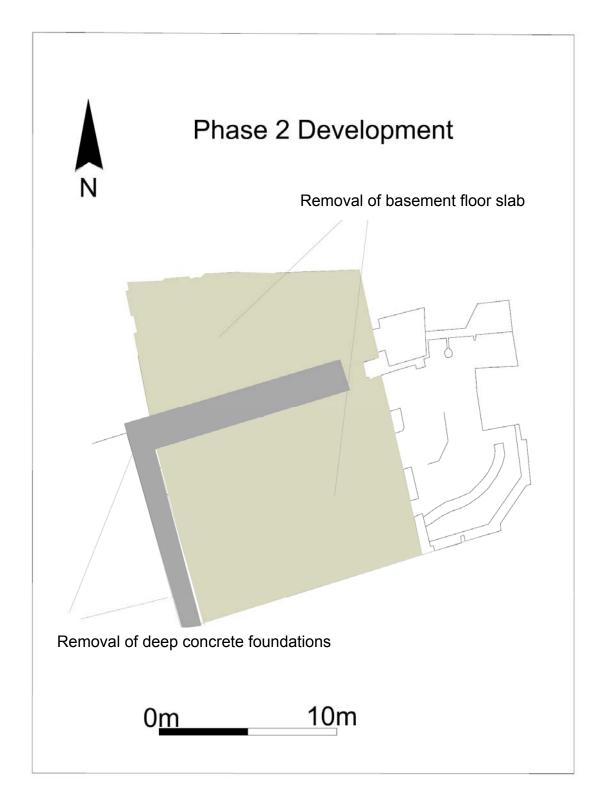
Location plan of the removed concrete foundations and basement floor slab within the development site.
